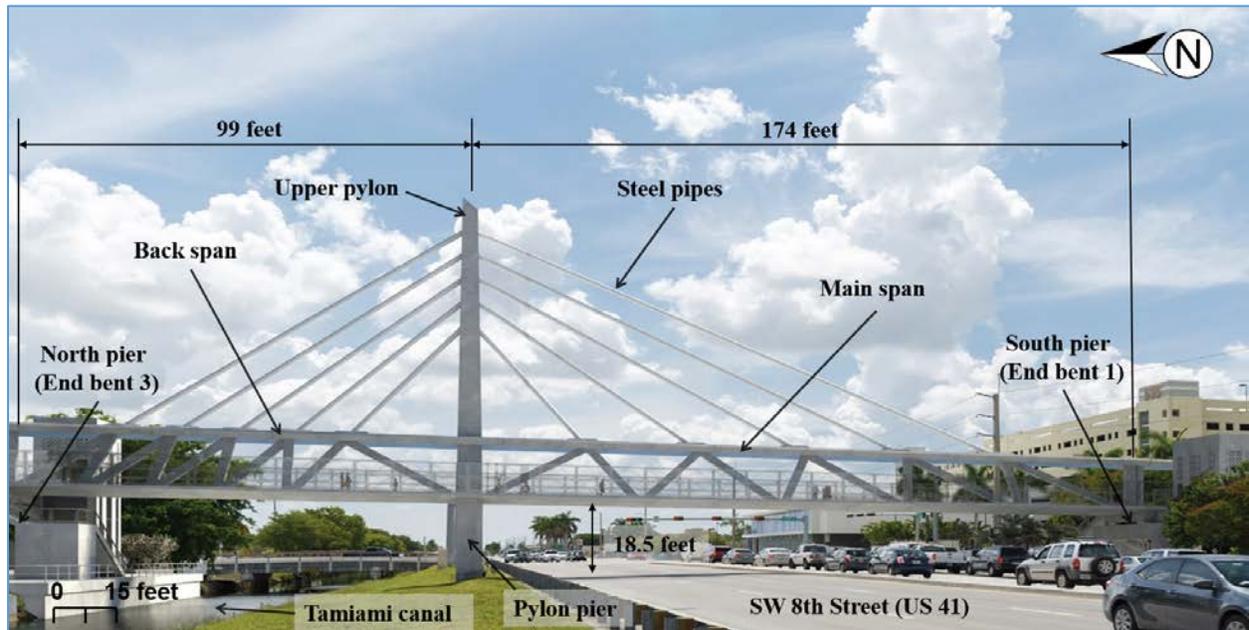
East-view rendering of completed UCPP pedestrian bridge. Note: This depiction does not illustrate the 11-foot northward shift of the bridge to accommodate a future westbound express bus lane on SW 8th Street or the construction of a bulkhead wall on the south Tamiami Canal bank. (Source: FIU, annotated by NTSB)
